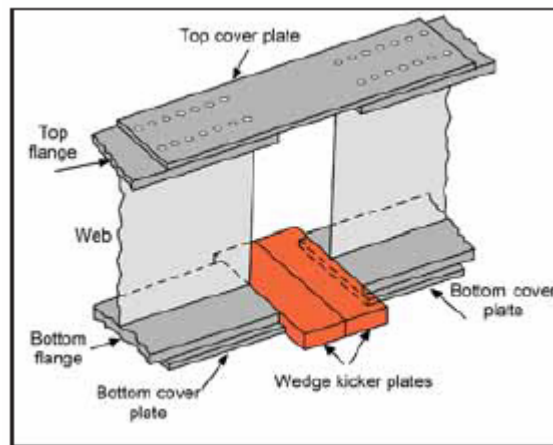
Detail of CLL Connection @ DuPont Access Road New Johnsonville, Tennessee (Talbot 2005)
